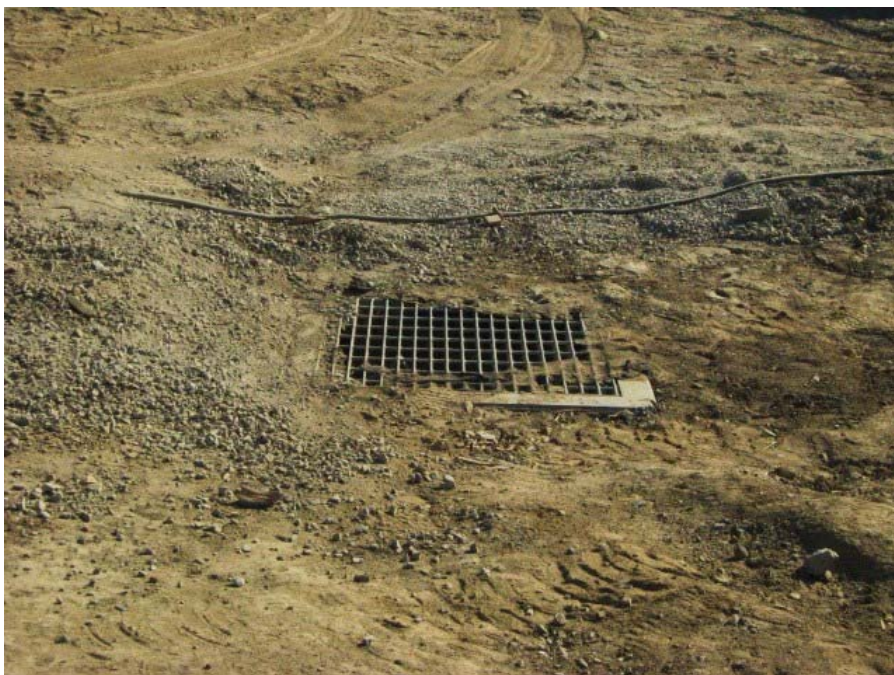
Site storm drain without protection. Drain chamber appeared to be completely filled with sediment.
